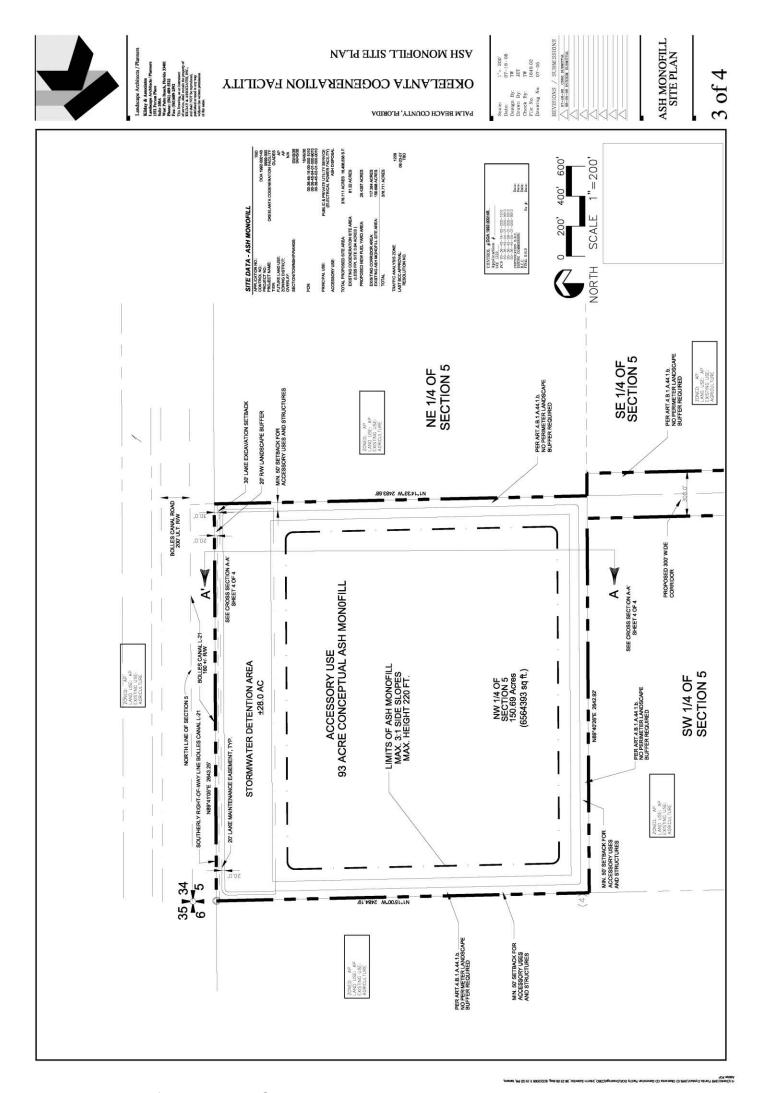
Ash Monofill Preliminary Site Plan dated August 25, 2008
